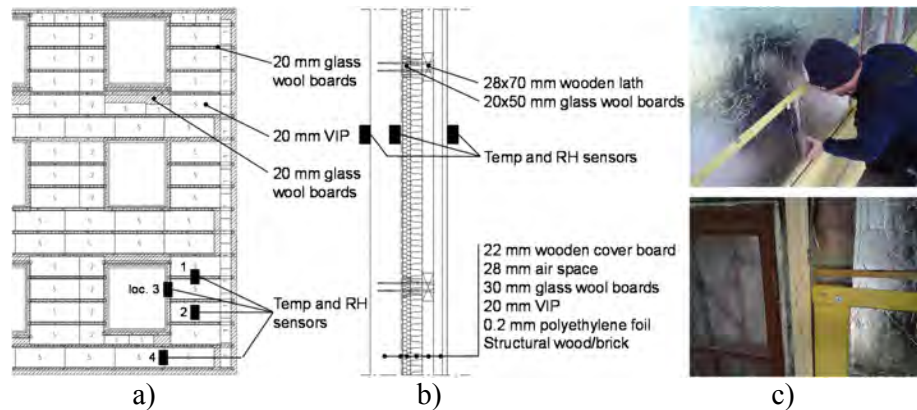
a) wall layout after retrofitting with 20 mm VIP and 30 mm glass wool boards, b) section of the wall layout with the location of the temperature and RH sensors in the wall marked by the black boxes (not in scale), c) installation of the VIP layer with the glass wool boards creating a thermal bridge between the VIP themselves and between the VIP and windows.
